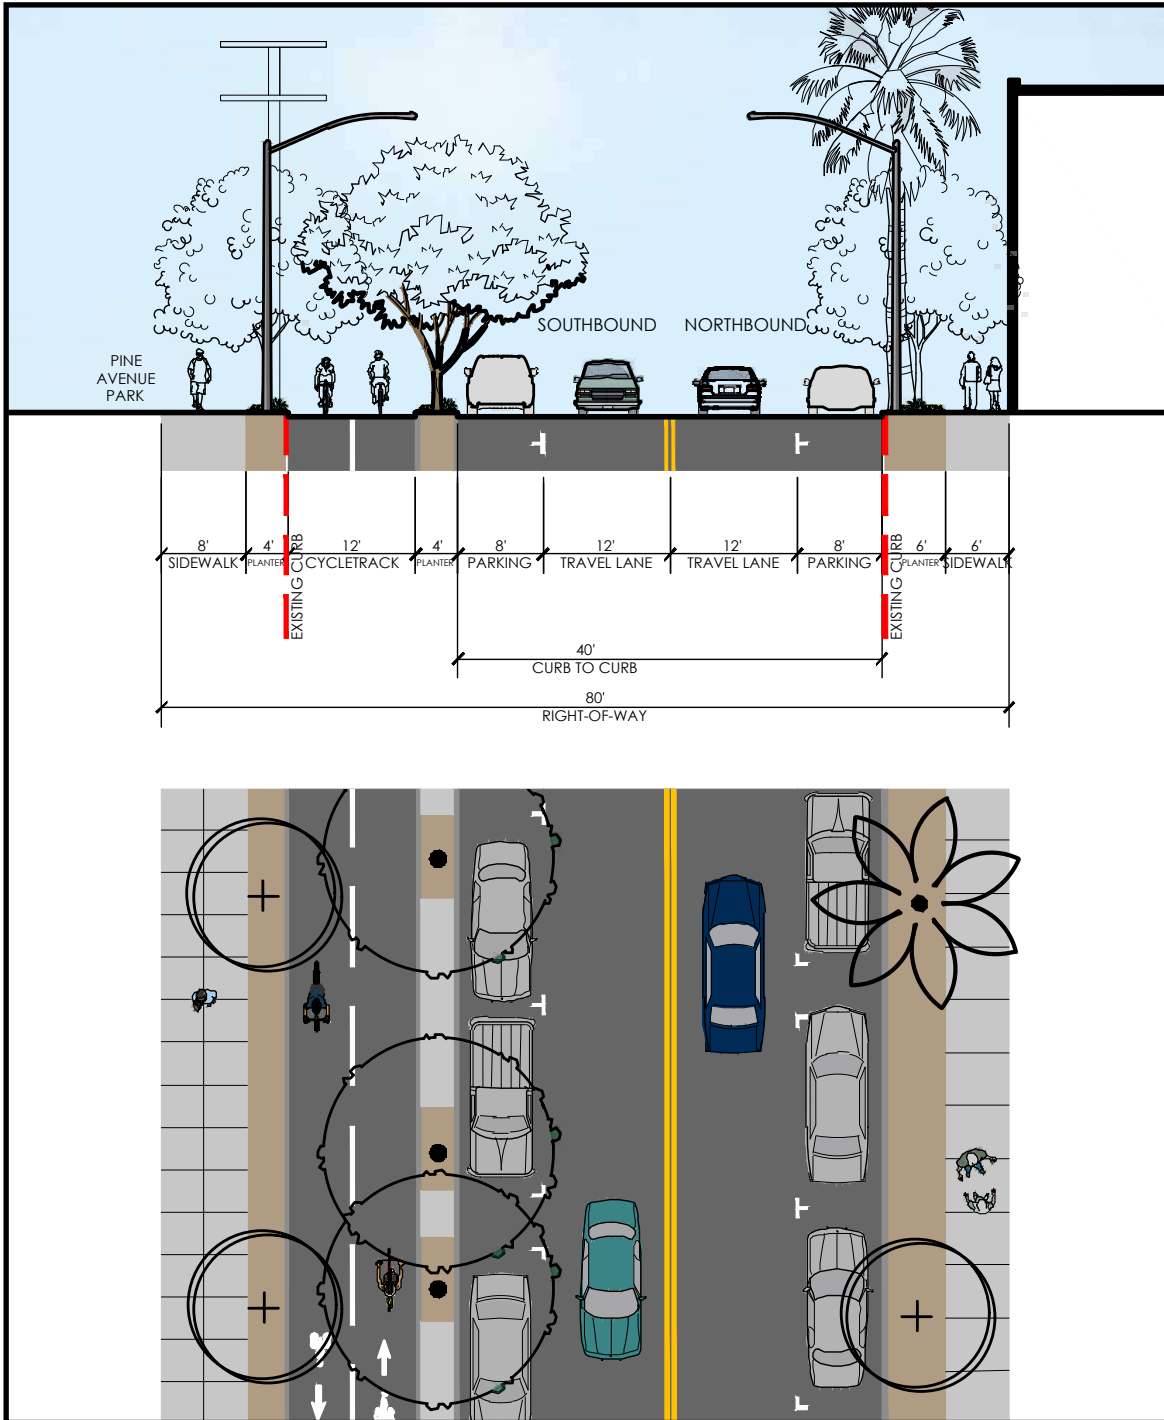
, Harding Street: Proposed Conditions A (along Pine Avenue Park)
